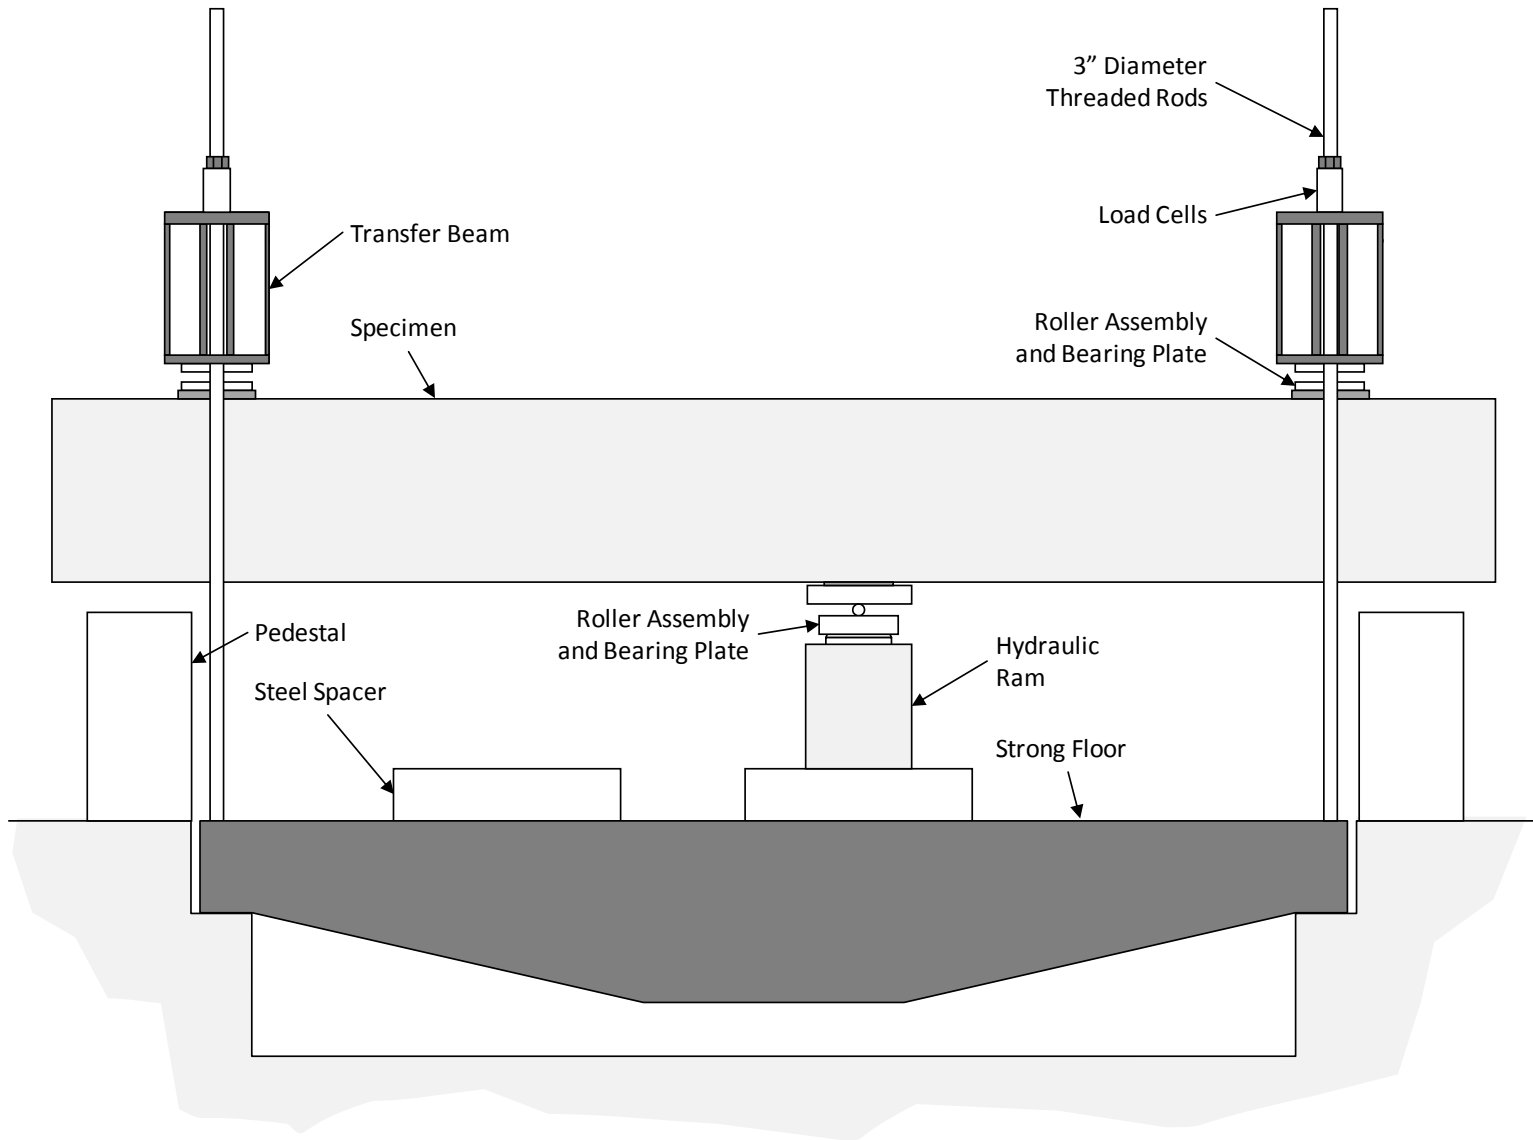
Large-Scale Beam Test Facility, Elevation View
